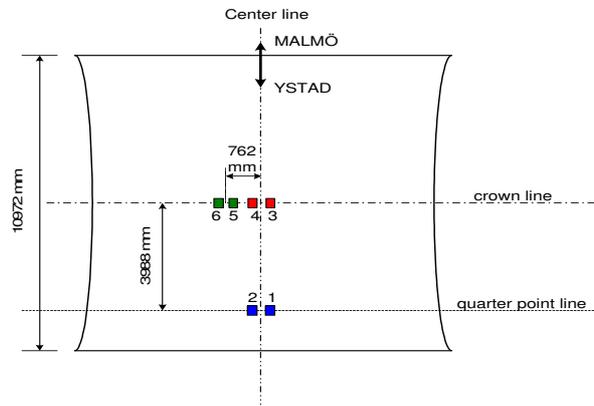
Culvert from the top with locations of strain gauges and travel directions
